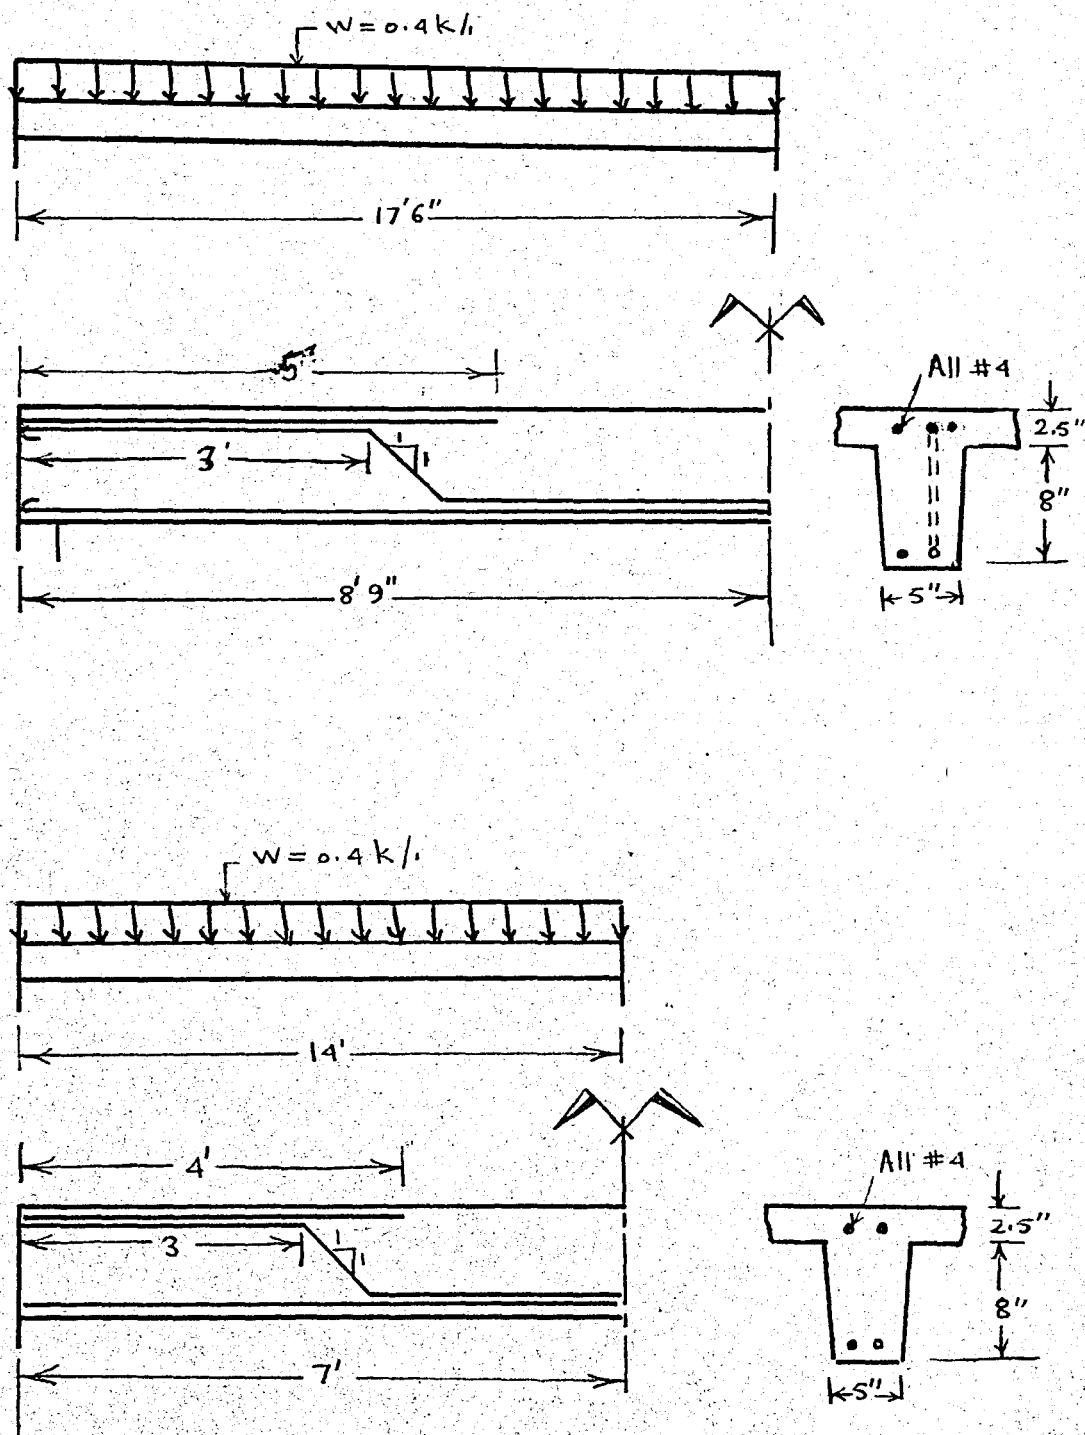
Fixed - Fixed T-Beams ; Loads & Steel Reinforcement.
